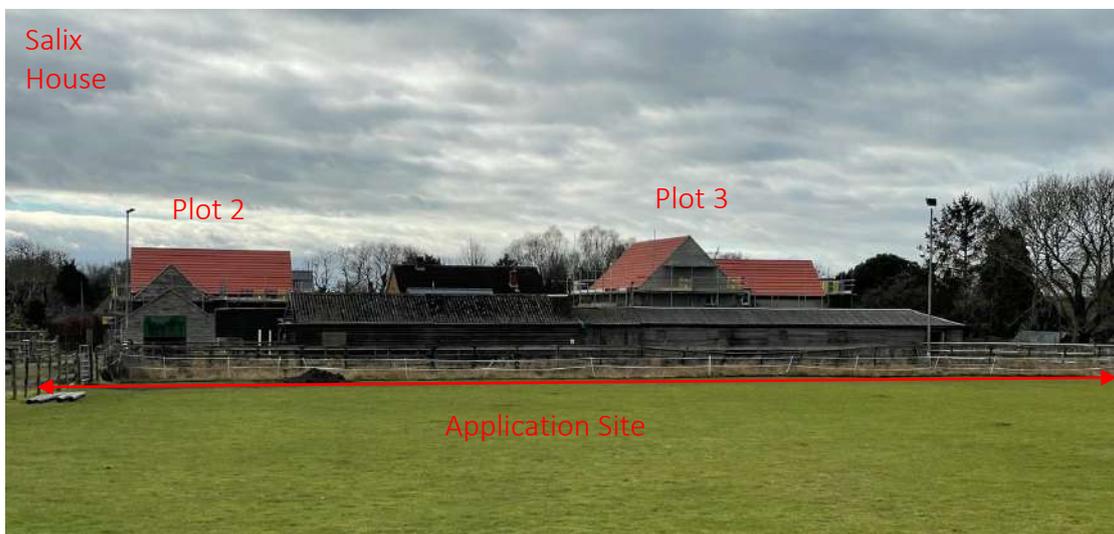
Zoomed in view from north of application site and existing dominate development beyond to south
